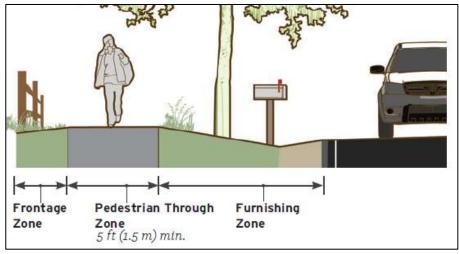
Five Foot Sidewalk with Frontage and Furnishing Zones
